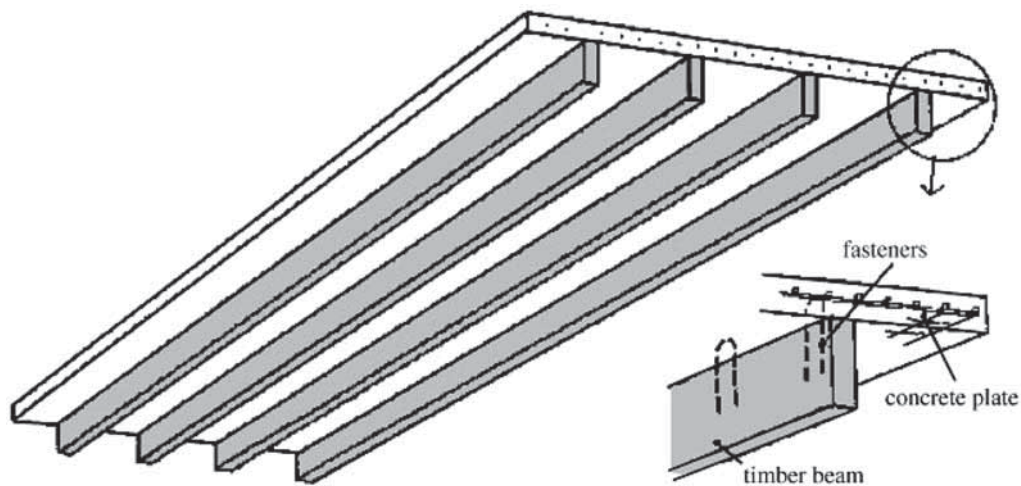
Schematic of a typical timber-concrete composite floor system (Ceccotti, 2002).
